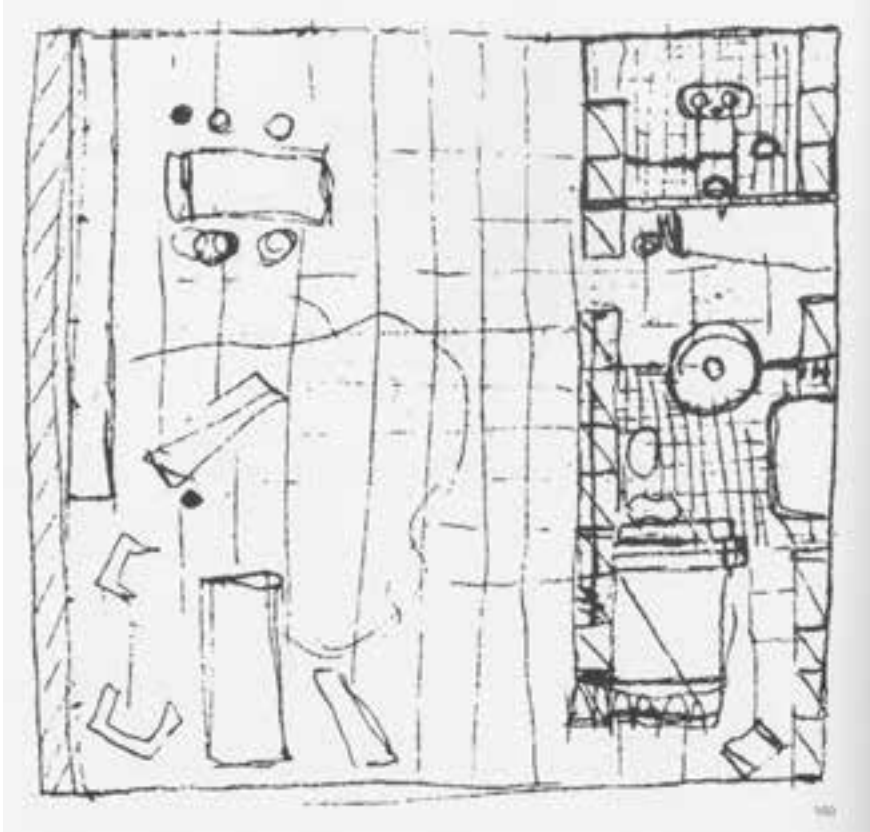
Le Corbusier, Charlotte Perriand, and Pierre Jeanneret, Equipment of a Dwelling, Stand at Salon d'Automne, Paris, France, 1929, Sketch of the floor plan. ©Foundation Le Corbusier, Paris. ©Foundation Le Corbusier, Paris.
